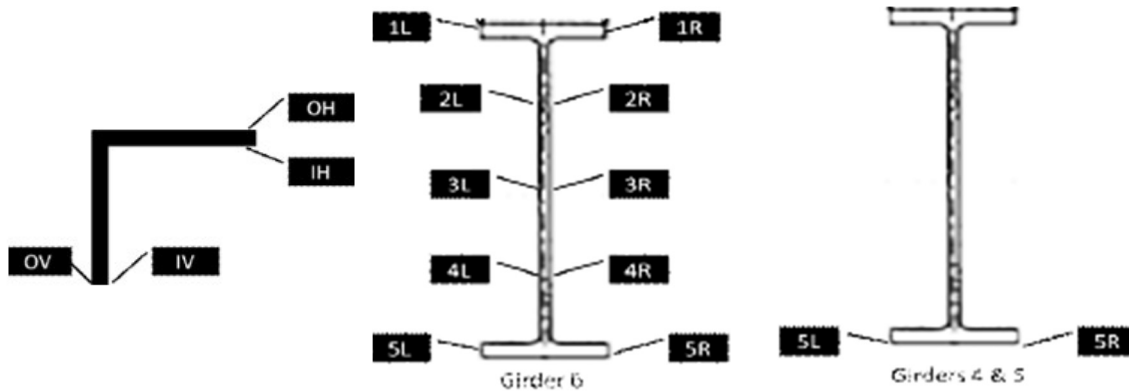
Lubbock Bridge (a) Brace Angle and (b) Girder Gage Locations (Romage, 2008)
